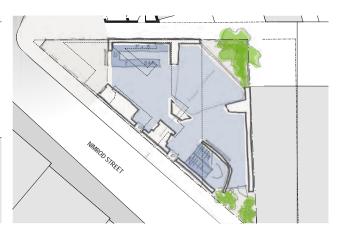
Ground Floor Plan - Daytime. Source: TZG Architects, 2022.
